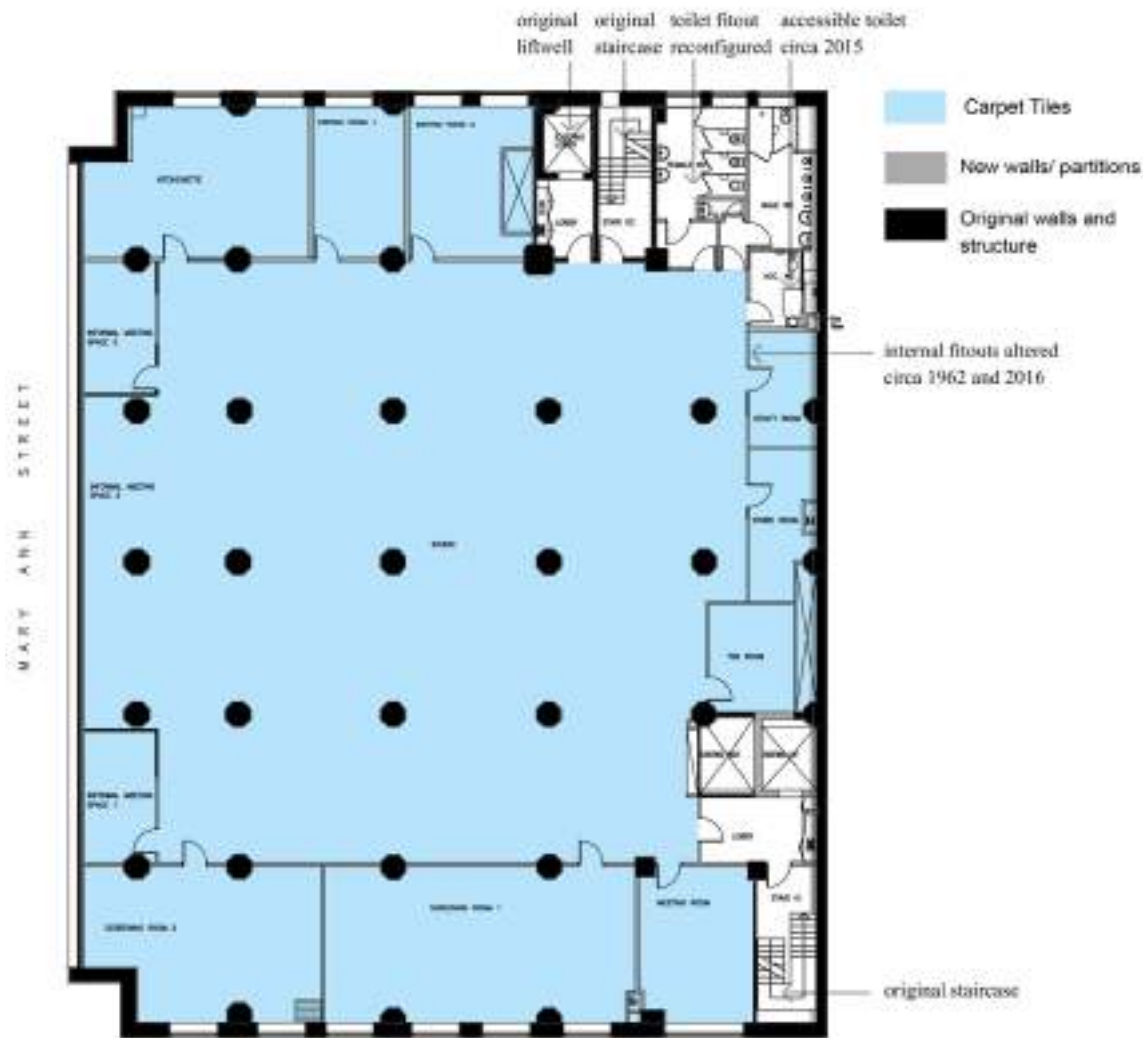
Third Floor Level (Level 4) existing layout.
